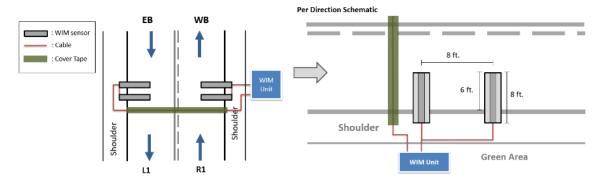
Portable WIM Installation Schematic Plan for Both Directions.
